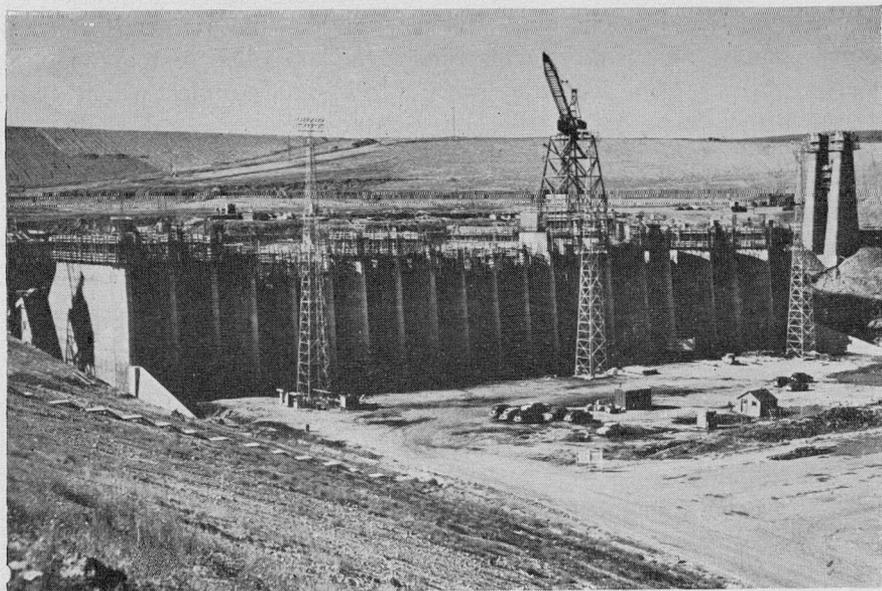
INTAKE STRUCTURE—GARRISON DAM.
